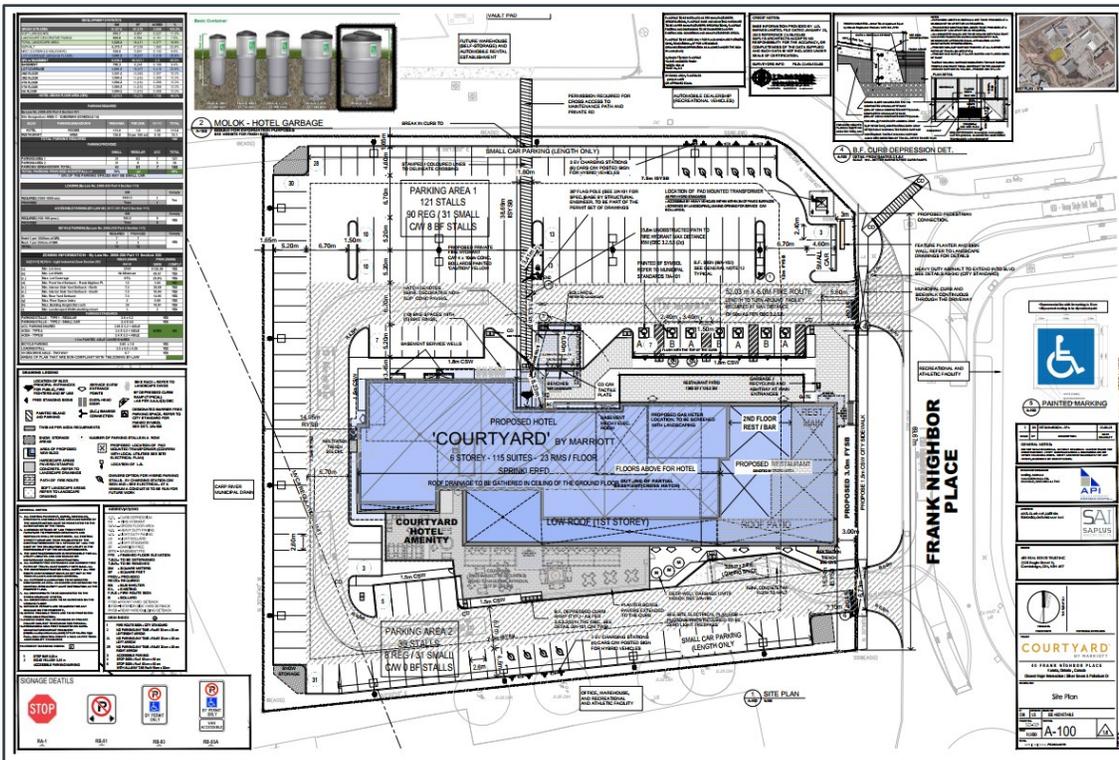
Proposed Site Plan prepared by Saplys Architects Inc., provided by the Client.
